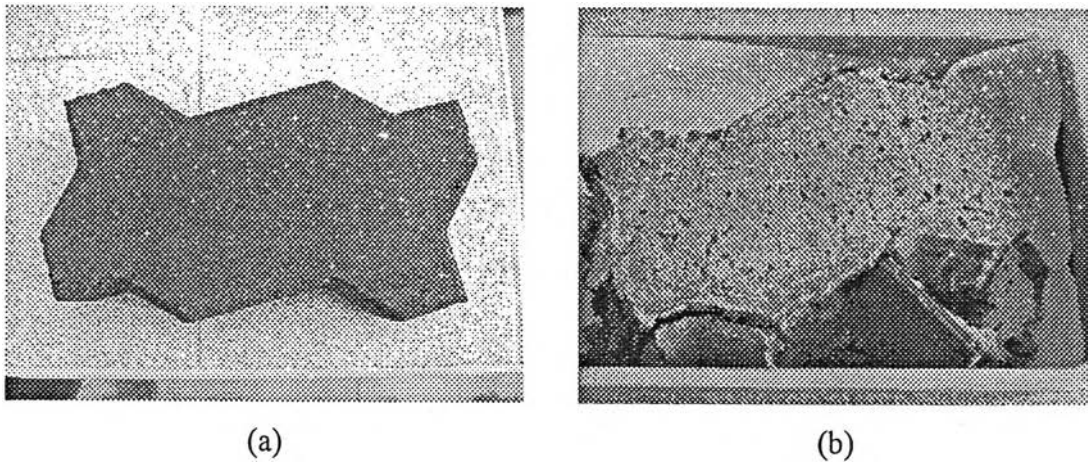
Interlocking Paving Concrete Block (a) Before and (b) After Compressive Strength Test
